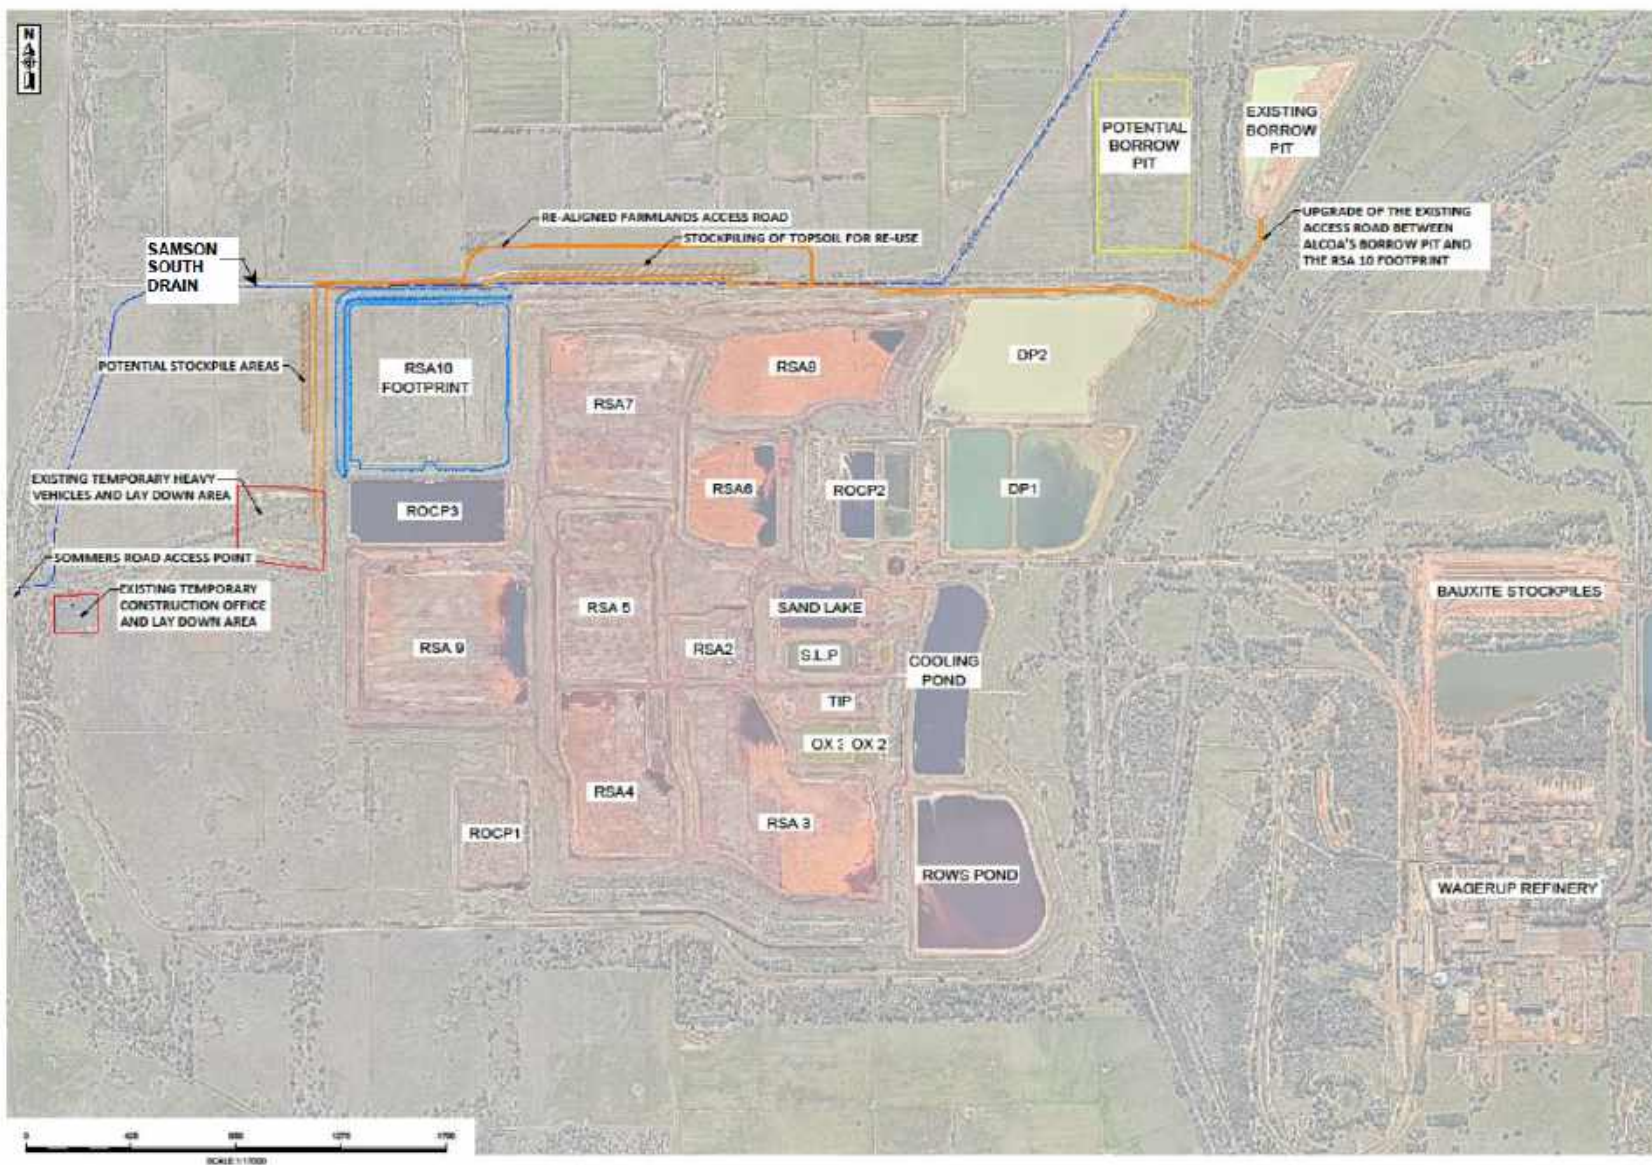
RSA 10 Existing and Proposed Infrastructure Locations
